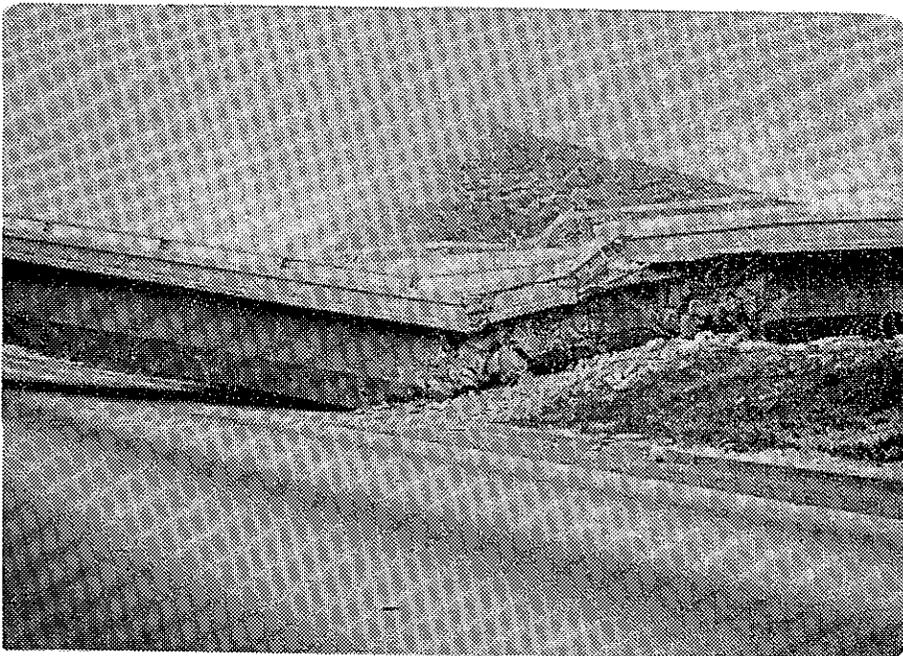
The center portion of the collapsed Route 5 southbound truck freeway bridge.
